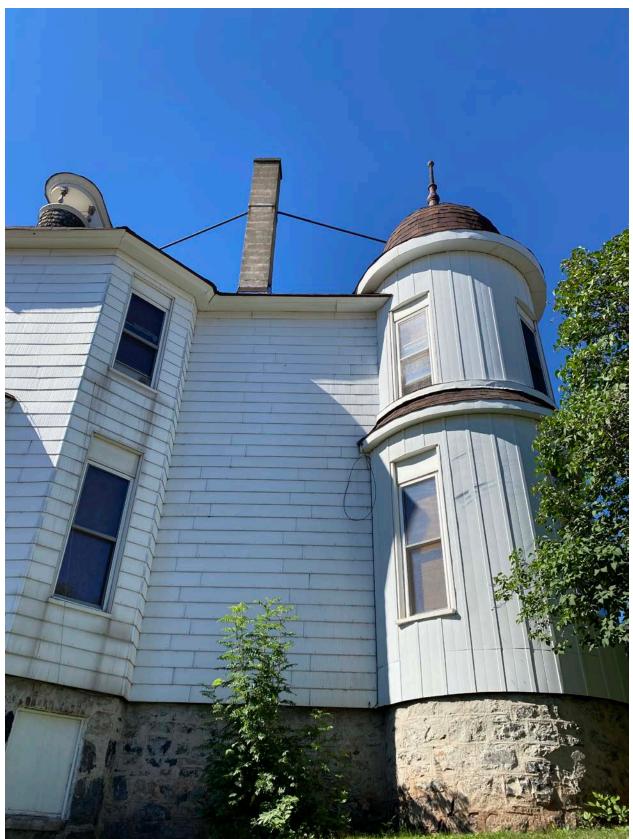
View of tower, chimney, and dormer at the east elevation, looking west.
